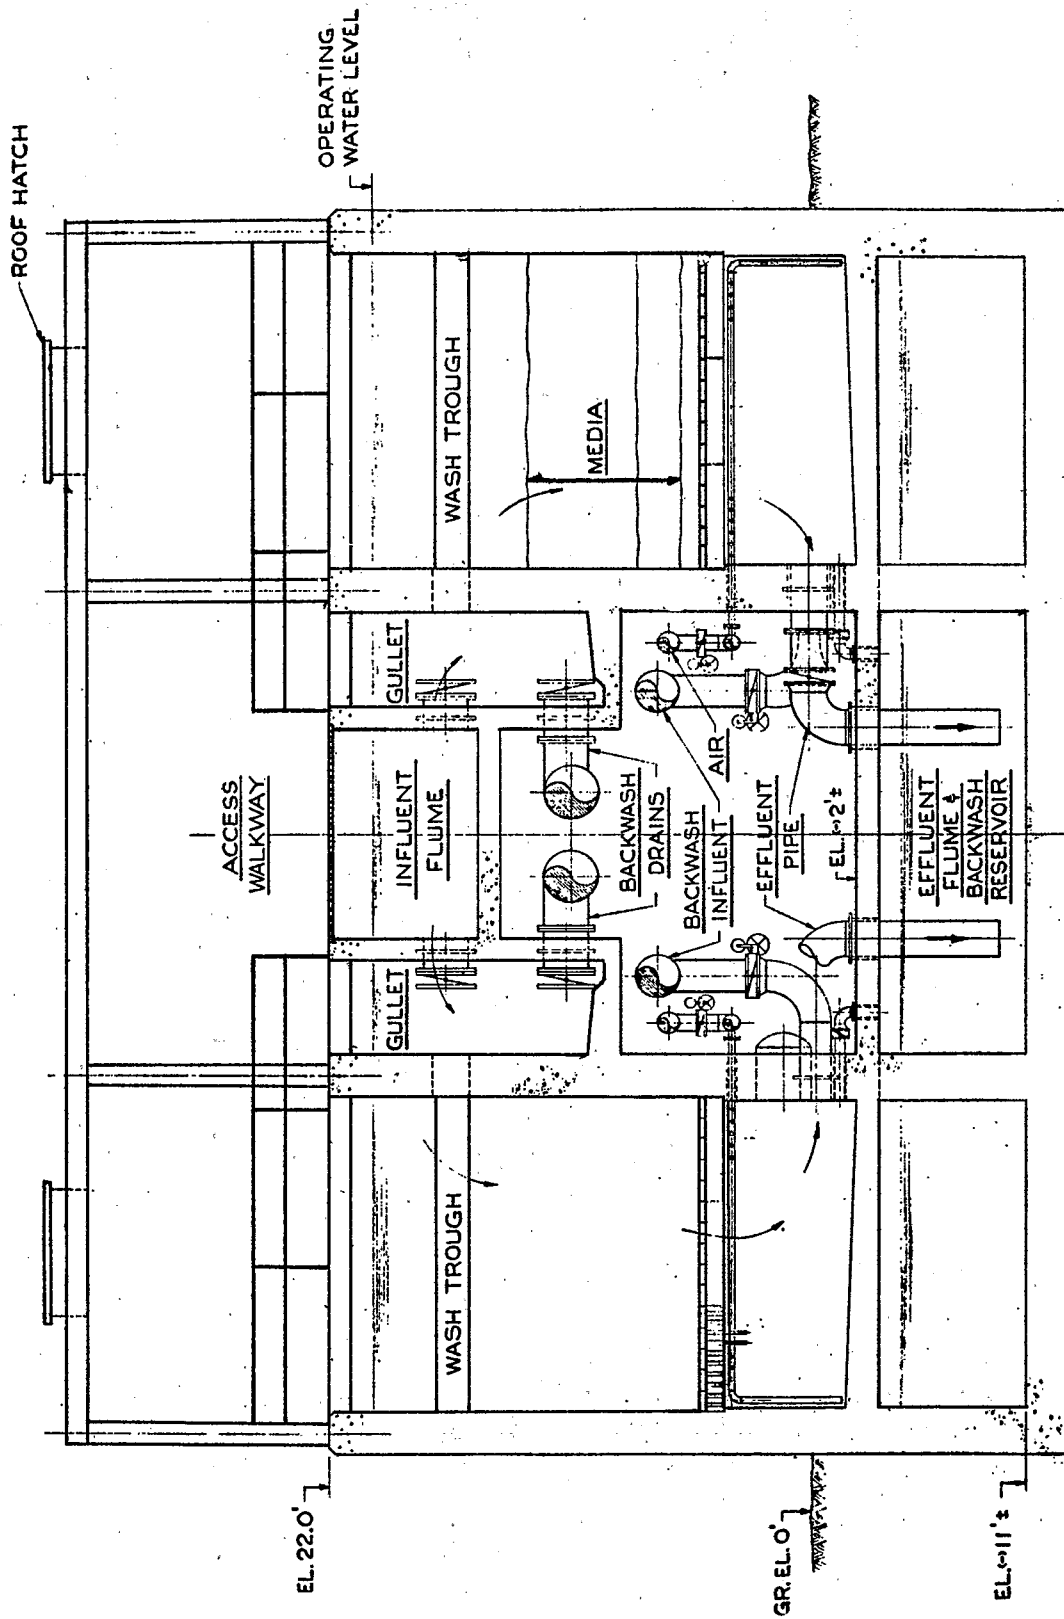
DUAL TREATMENT HRF INSTALLATION - TYPICAL FILTER SECTION
